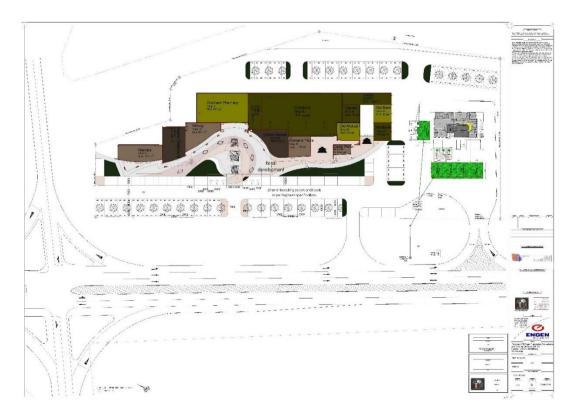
Proposed layout plan of the filling station and shopping centre
